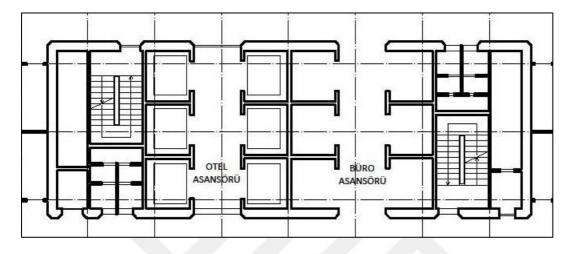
Core plan of Mersin Metropol Building (19. floor)
